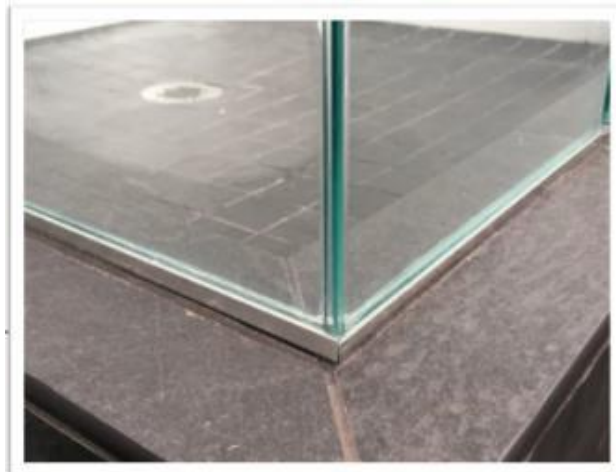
Example of channels used below the frameless shower enclosure to secure and seal the glass.
